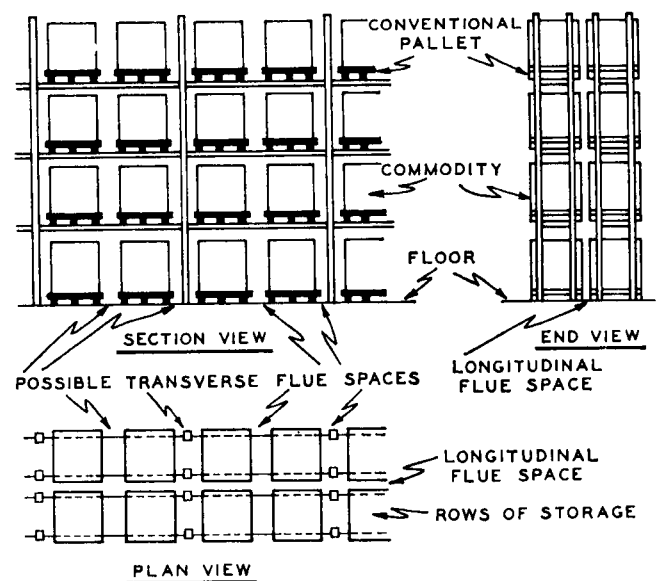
Typical Double Row (Back-to-Back) Rack Arrangement.
